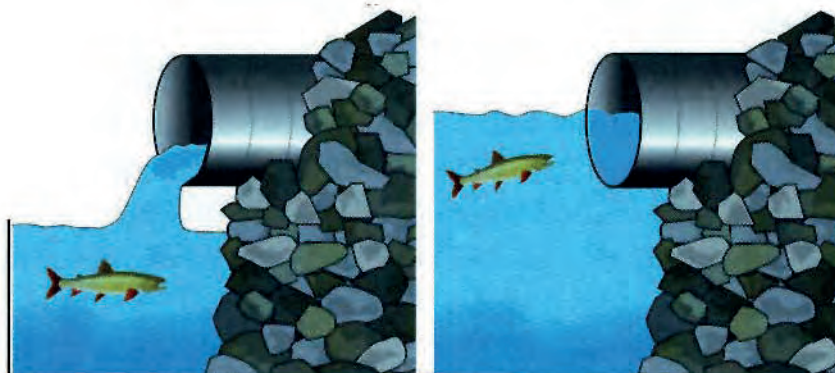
Perched Entrance and Properly Installed Culvert Entrance
